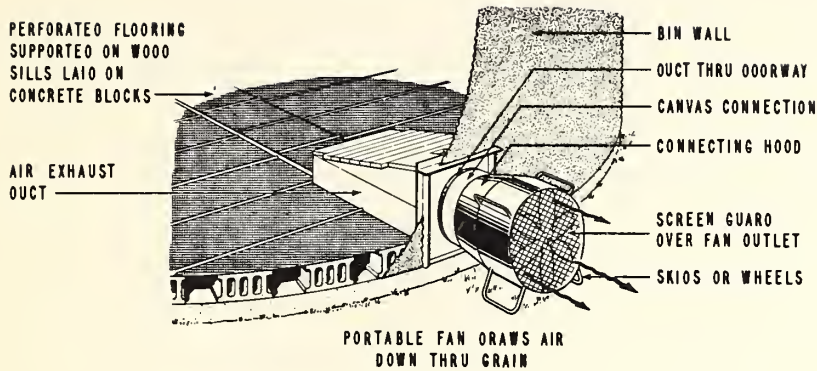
Cooling fan connected to circular bin equipped with perforated floor. See figure 13 for blower installation.
